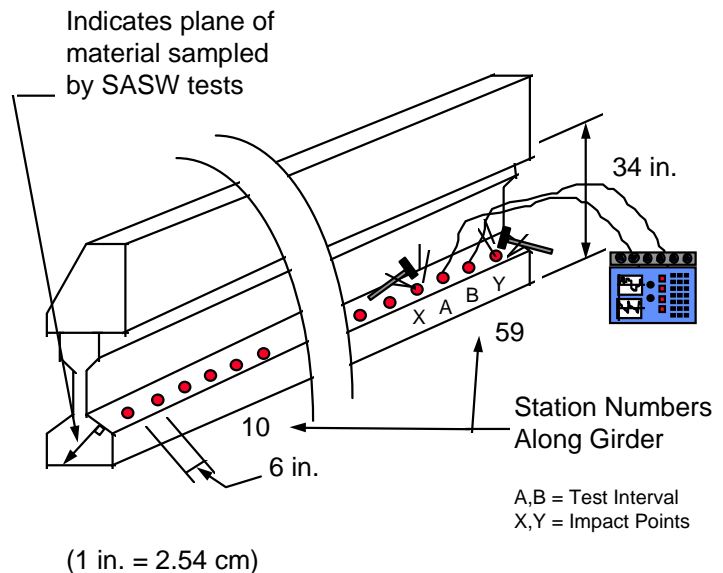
10 Schematic of SASW testing locations for damage assessment of Steck girder
